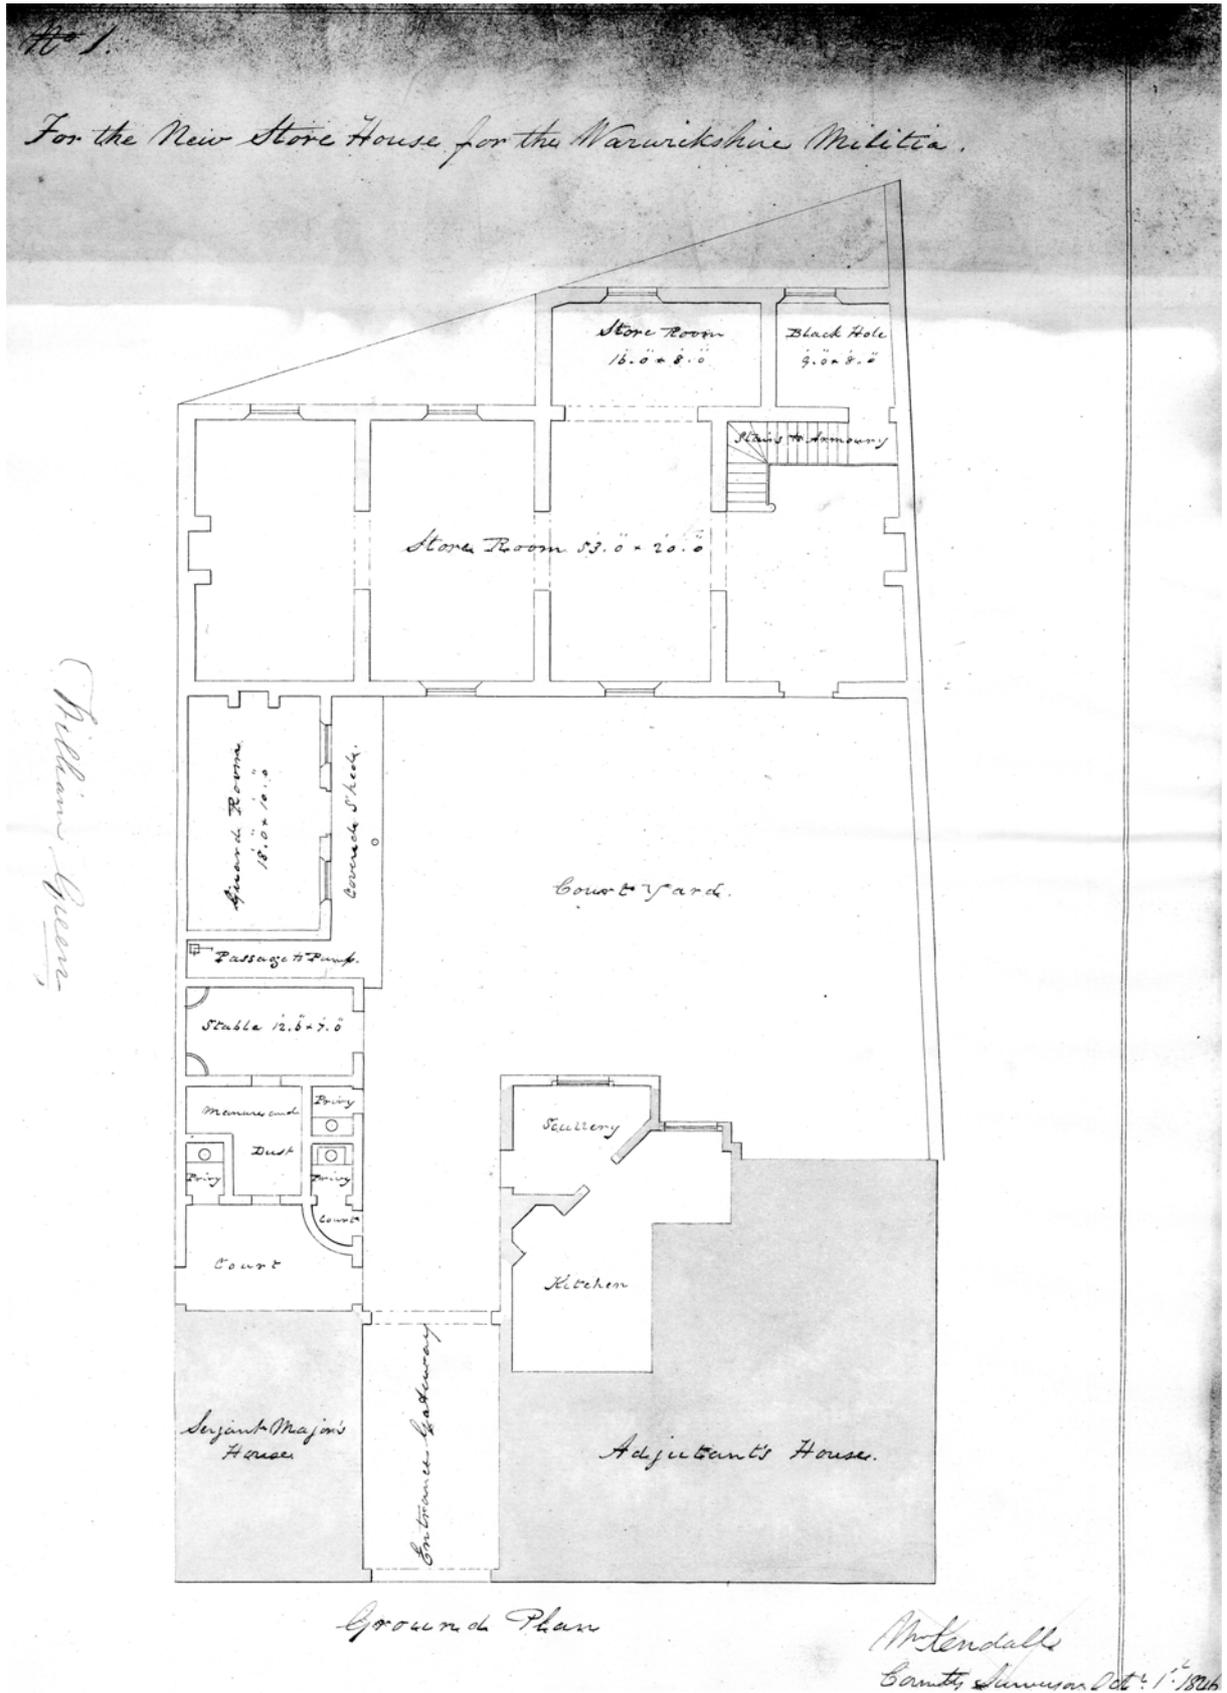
Plans of proposed new Militia Store and alterations to existing buildings, 1846 (WRO WRO QS 24/566)
